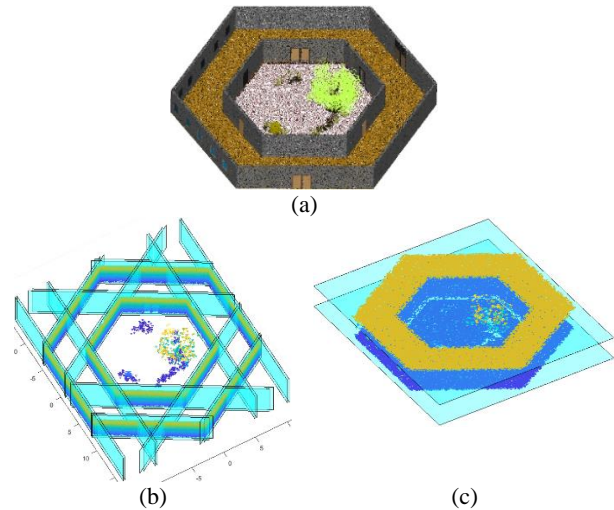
Extraction of potential building structures of the synthetic building: (a) synthetic point cloud (the ceiling is removed for better visualization), (b) vertical structures, i.e., walls, (c) horizontal structures, i.e., the ceiling and the floor.
